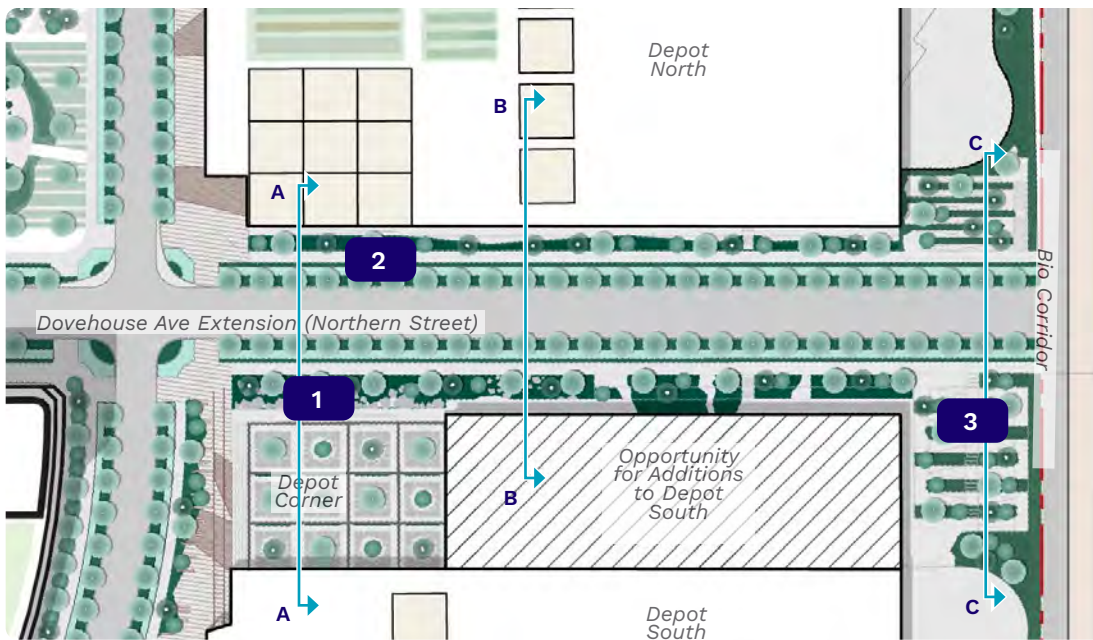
Concept Plan for Dovehouse Avenue Extension as it passes through the Depot Building and meets the underpass. Note: Any addition to Depot South will be the subject of future study.
